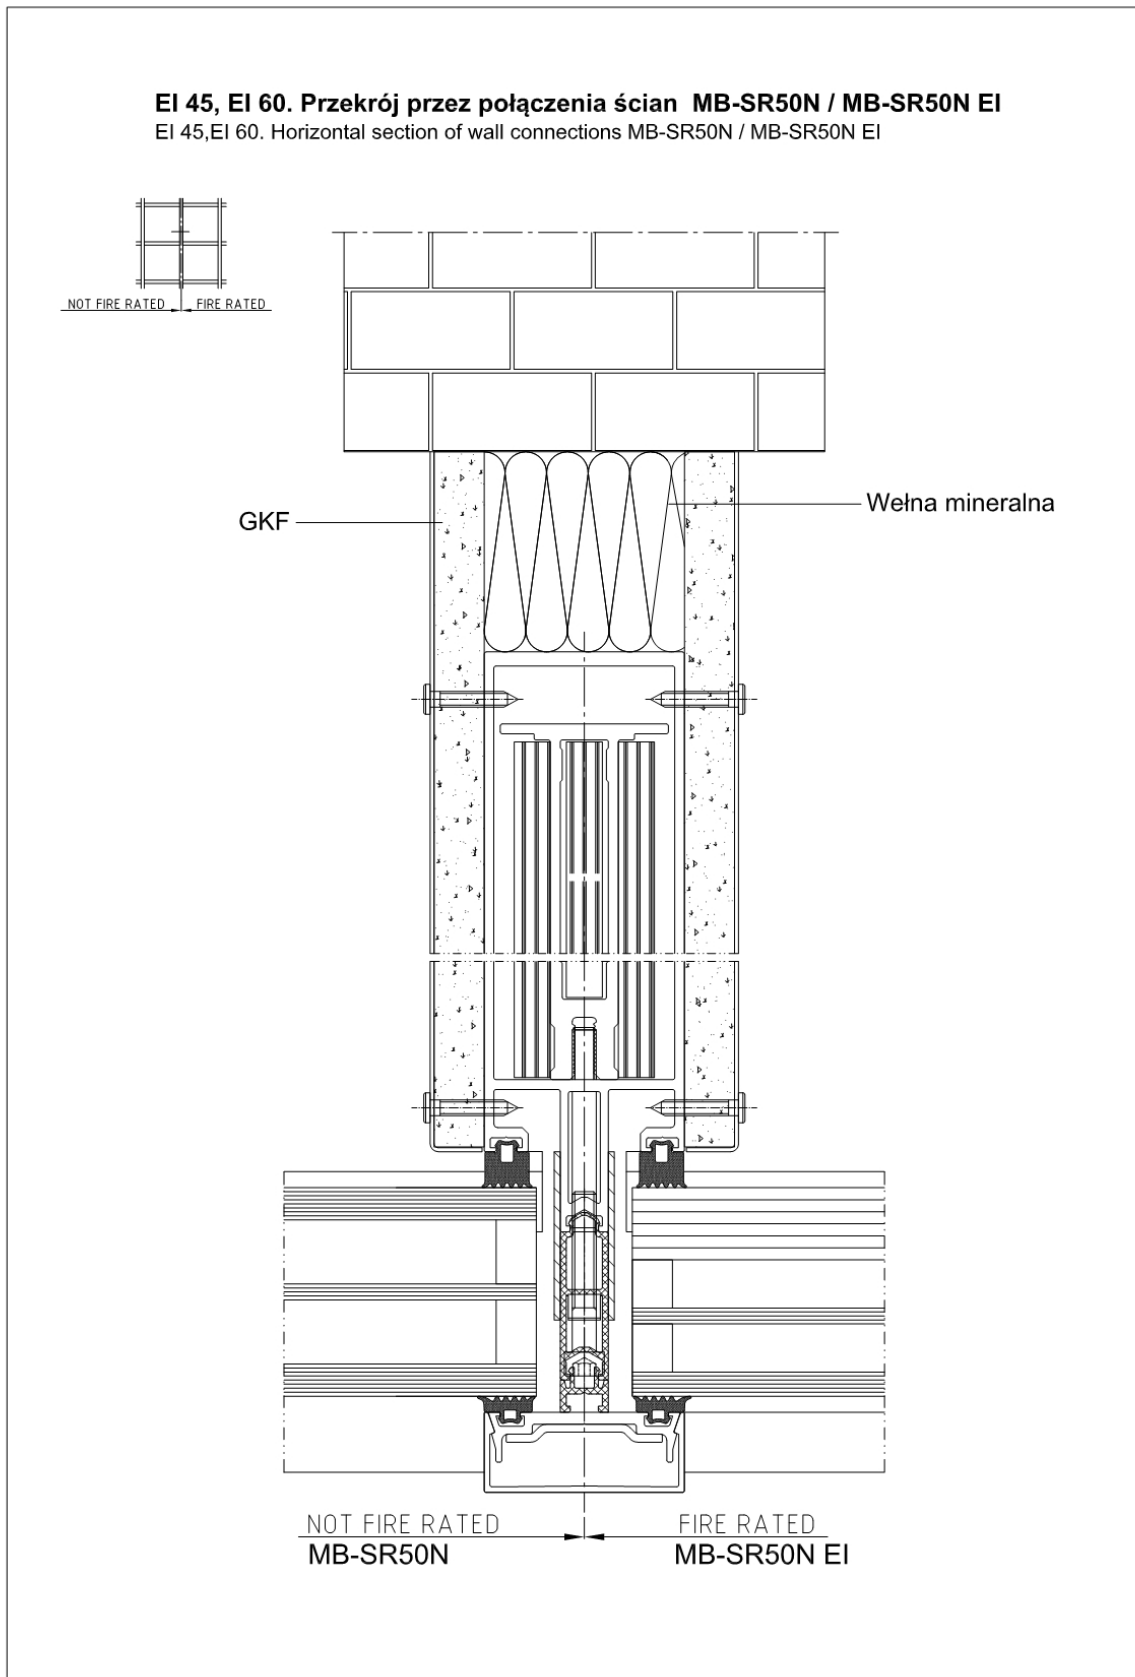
Cross-section through the connection of the MB-SR50N EI EI60 system wall with non - fire rated MB-SR50N system wall
